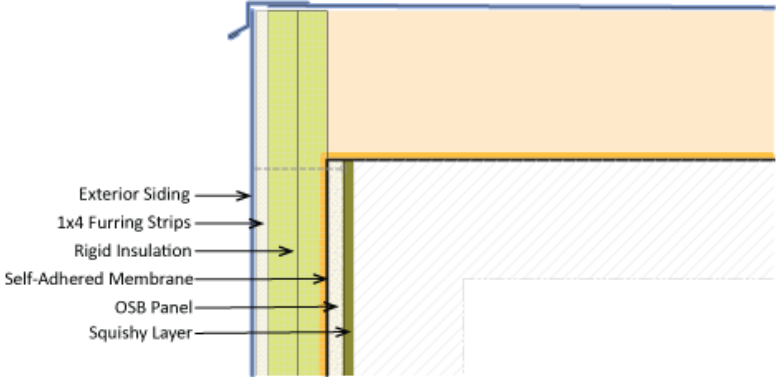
Flat Roof with Parapet, Option 1 – Section View
